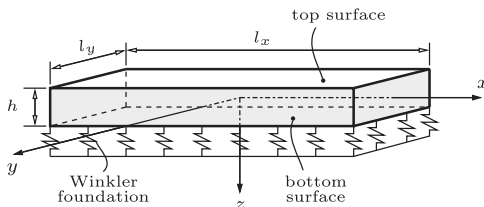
Structural model of a pavement slab: a rectangular plate with free edges rests on a Winkler foundation.
